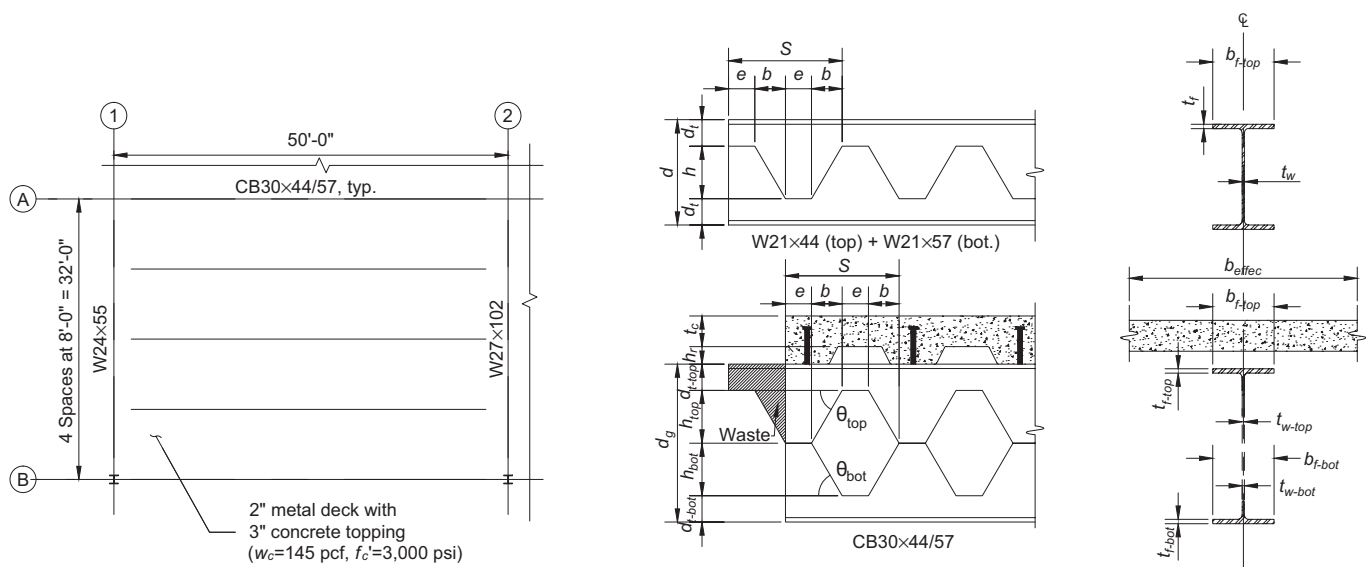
Structural framing layout and composite castellated beam nomenclature for Example 4.3.
